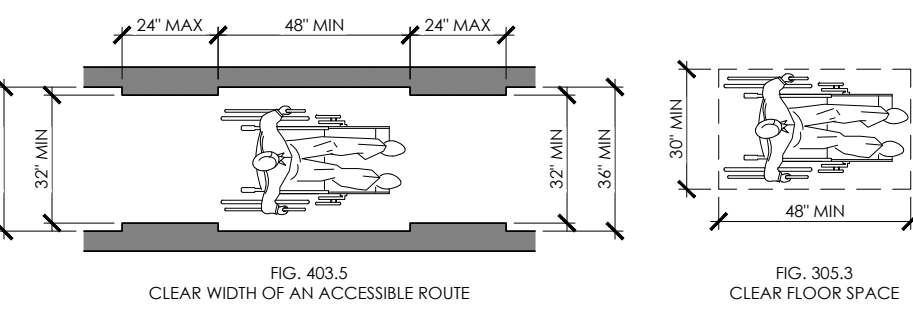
CLEAR WIDTH OF AN ACCESSIBLE ROUTE
